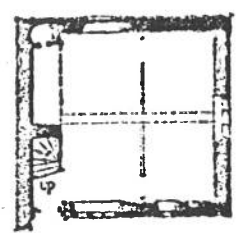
FLOOR PLAN OF THE ROGER MOWRY HOUSE (CA. 1653), PROVIDENCE, RHODE ISLAND
